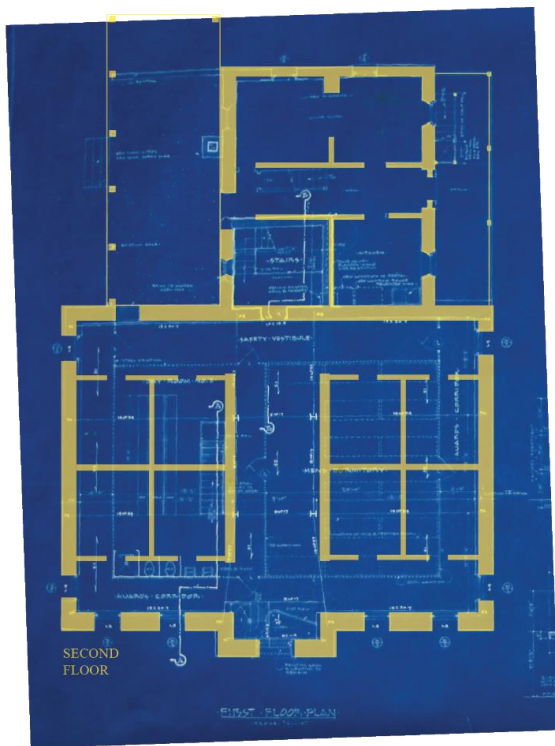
1952 Plans for 1954 renovation with original pre-renovation walls highlighted.
